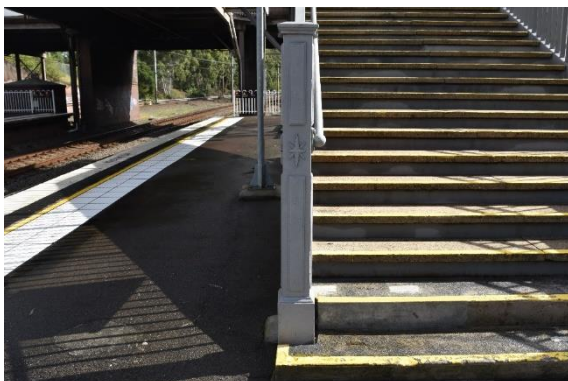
The steel support structure of the footbridge and staircase (Source: Artefact 2021)
